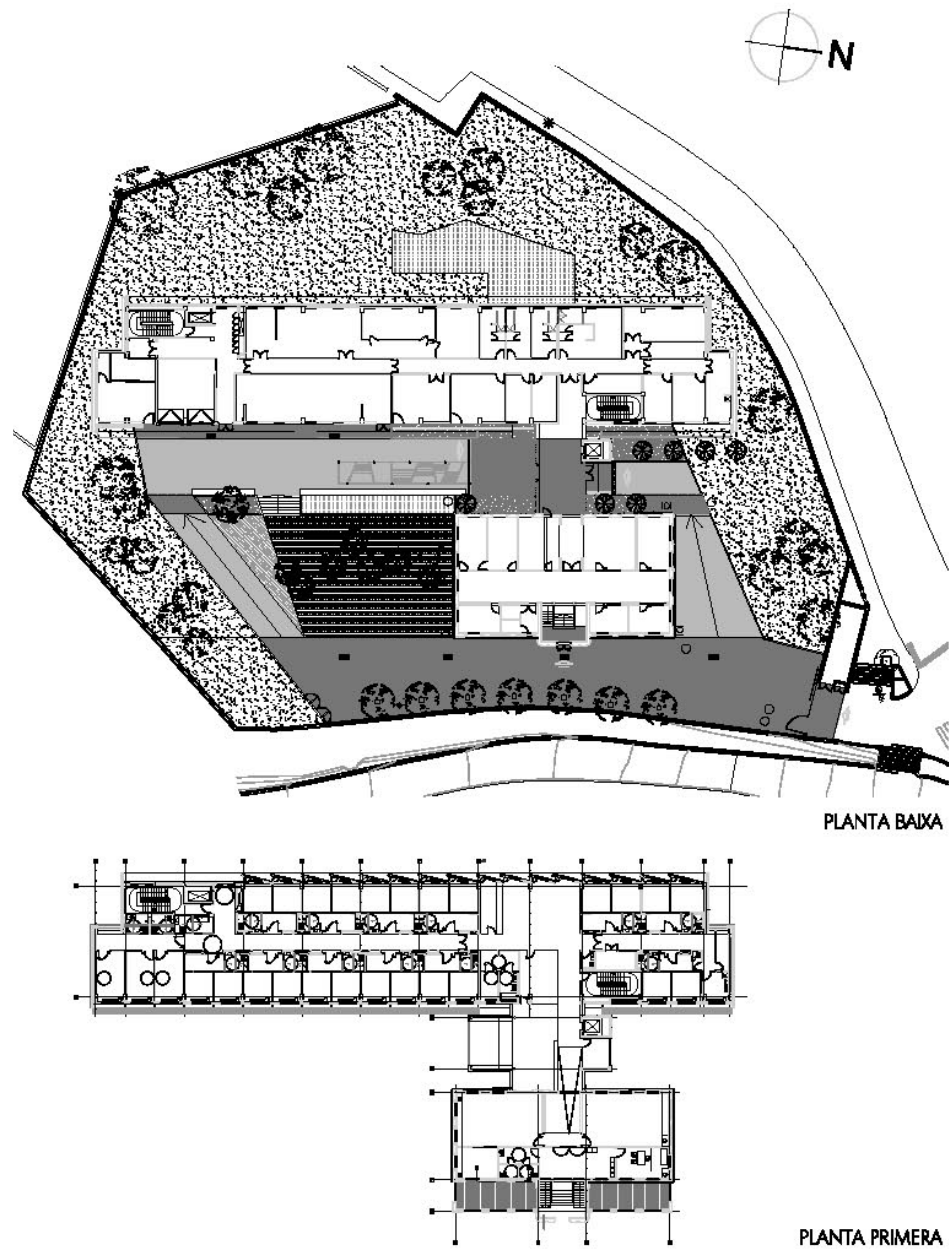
Plan of the project. (Source: provided by Luis Bravo)
